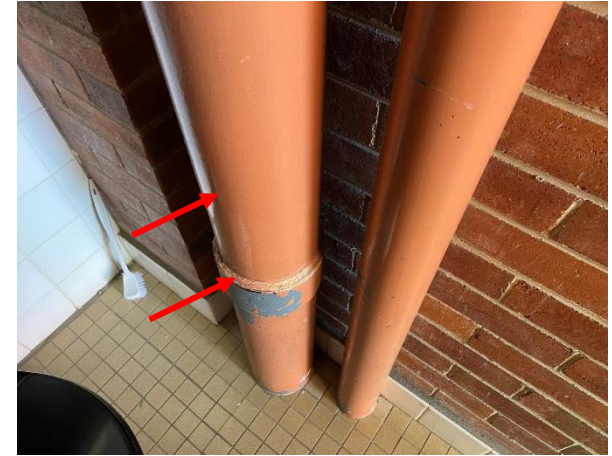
Building E – Asbestos ventilation pipe with asbestos mastic seals to collar joint extending from basement level through ER2009
